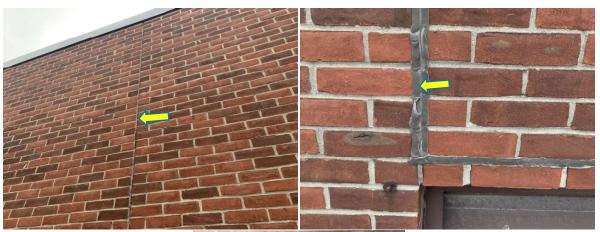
, 1.2, 1.3 and 1.4: View of the non-asbestos perimeter sealant joints on the exterior overhead door of the subject building.
